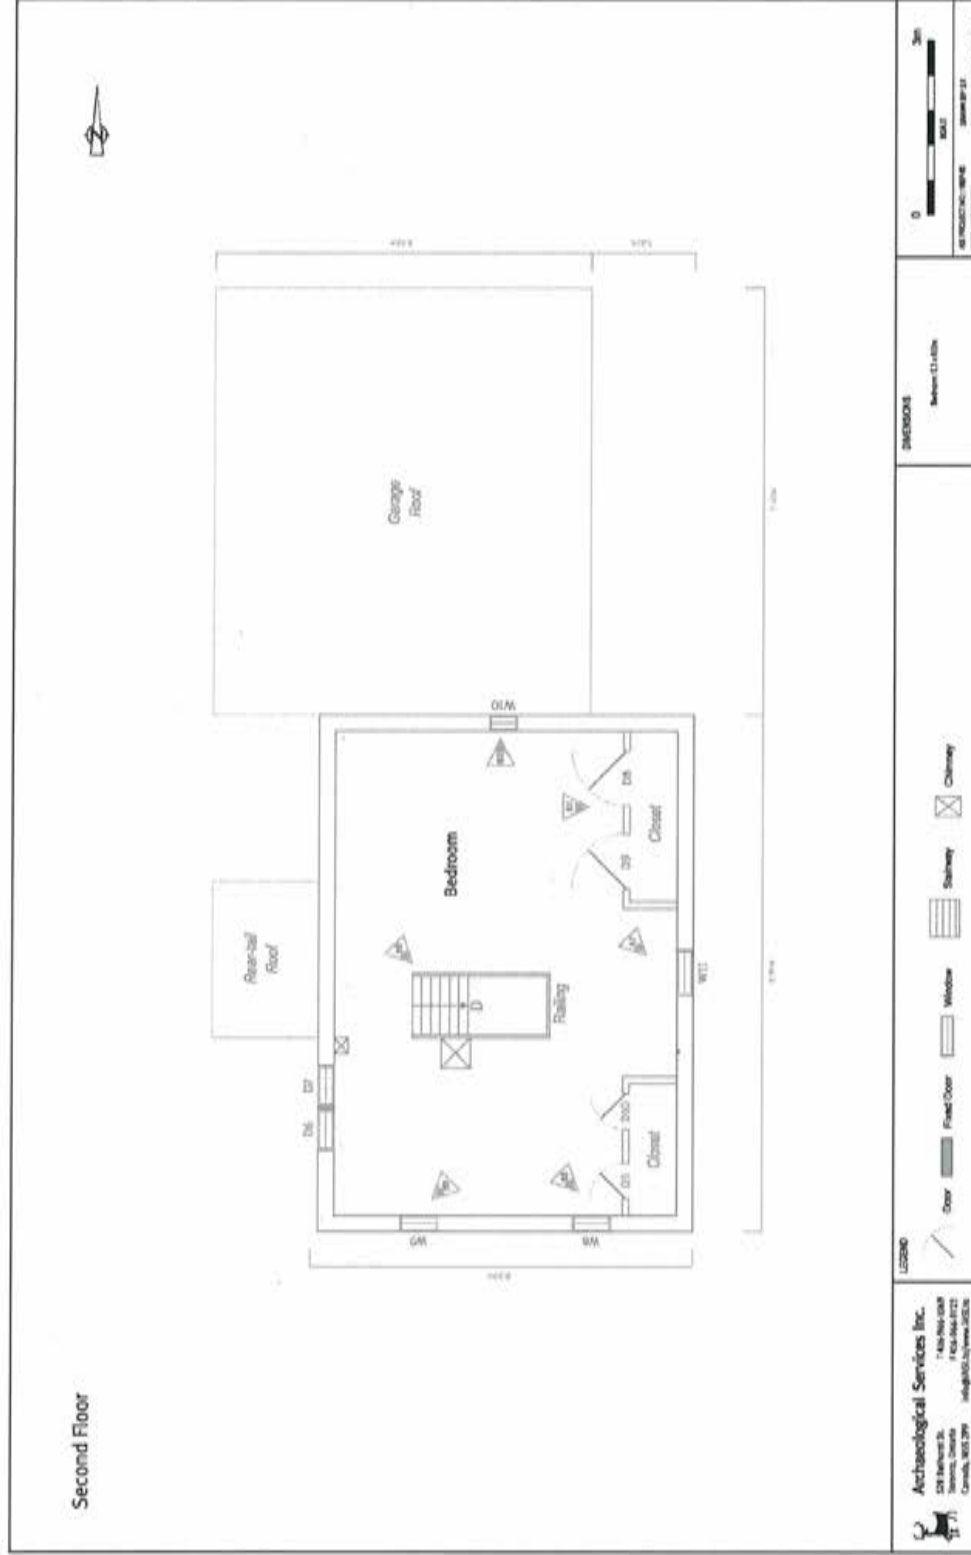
Interior floor plan of upper storey showing overall dimensional measurements of residential exterior and internal rooms.
